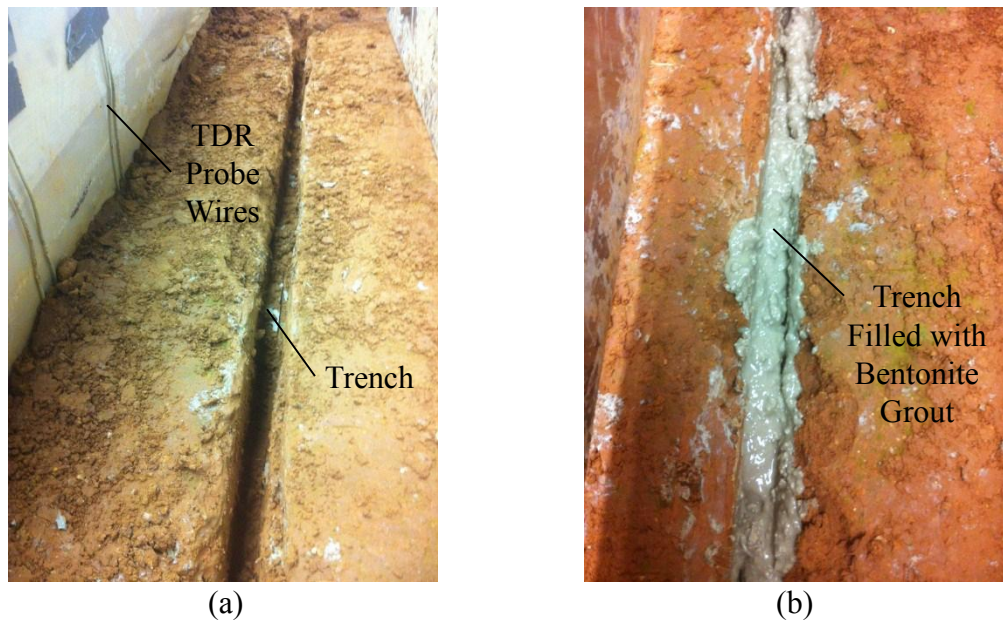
(a) Trench excavated with claw hammer (b) trench filled with bentonite slurry.
